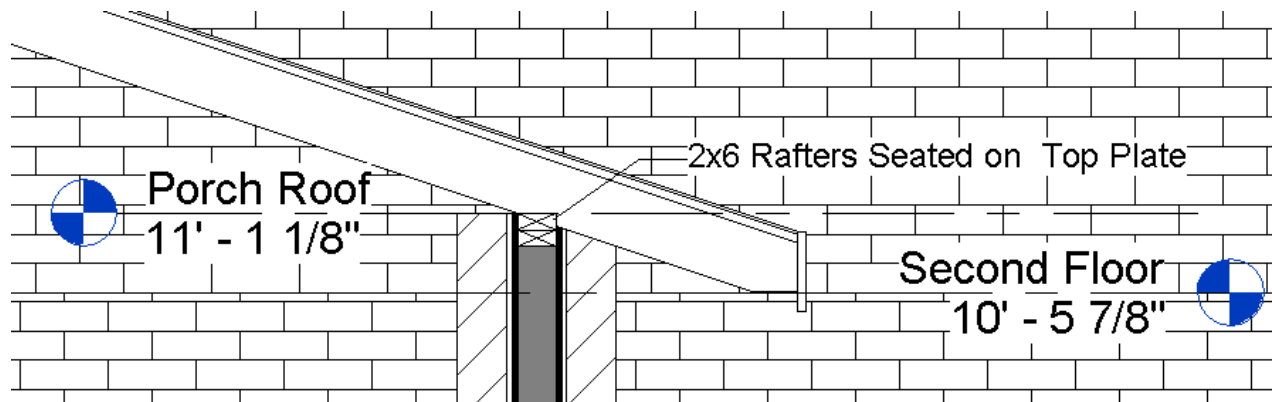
An Eave with geometry for a Rafter style roof is shown here.
